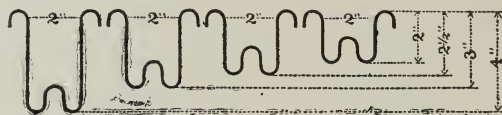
Berger Corrugated Steel Plate. Dimensions.
